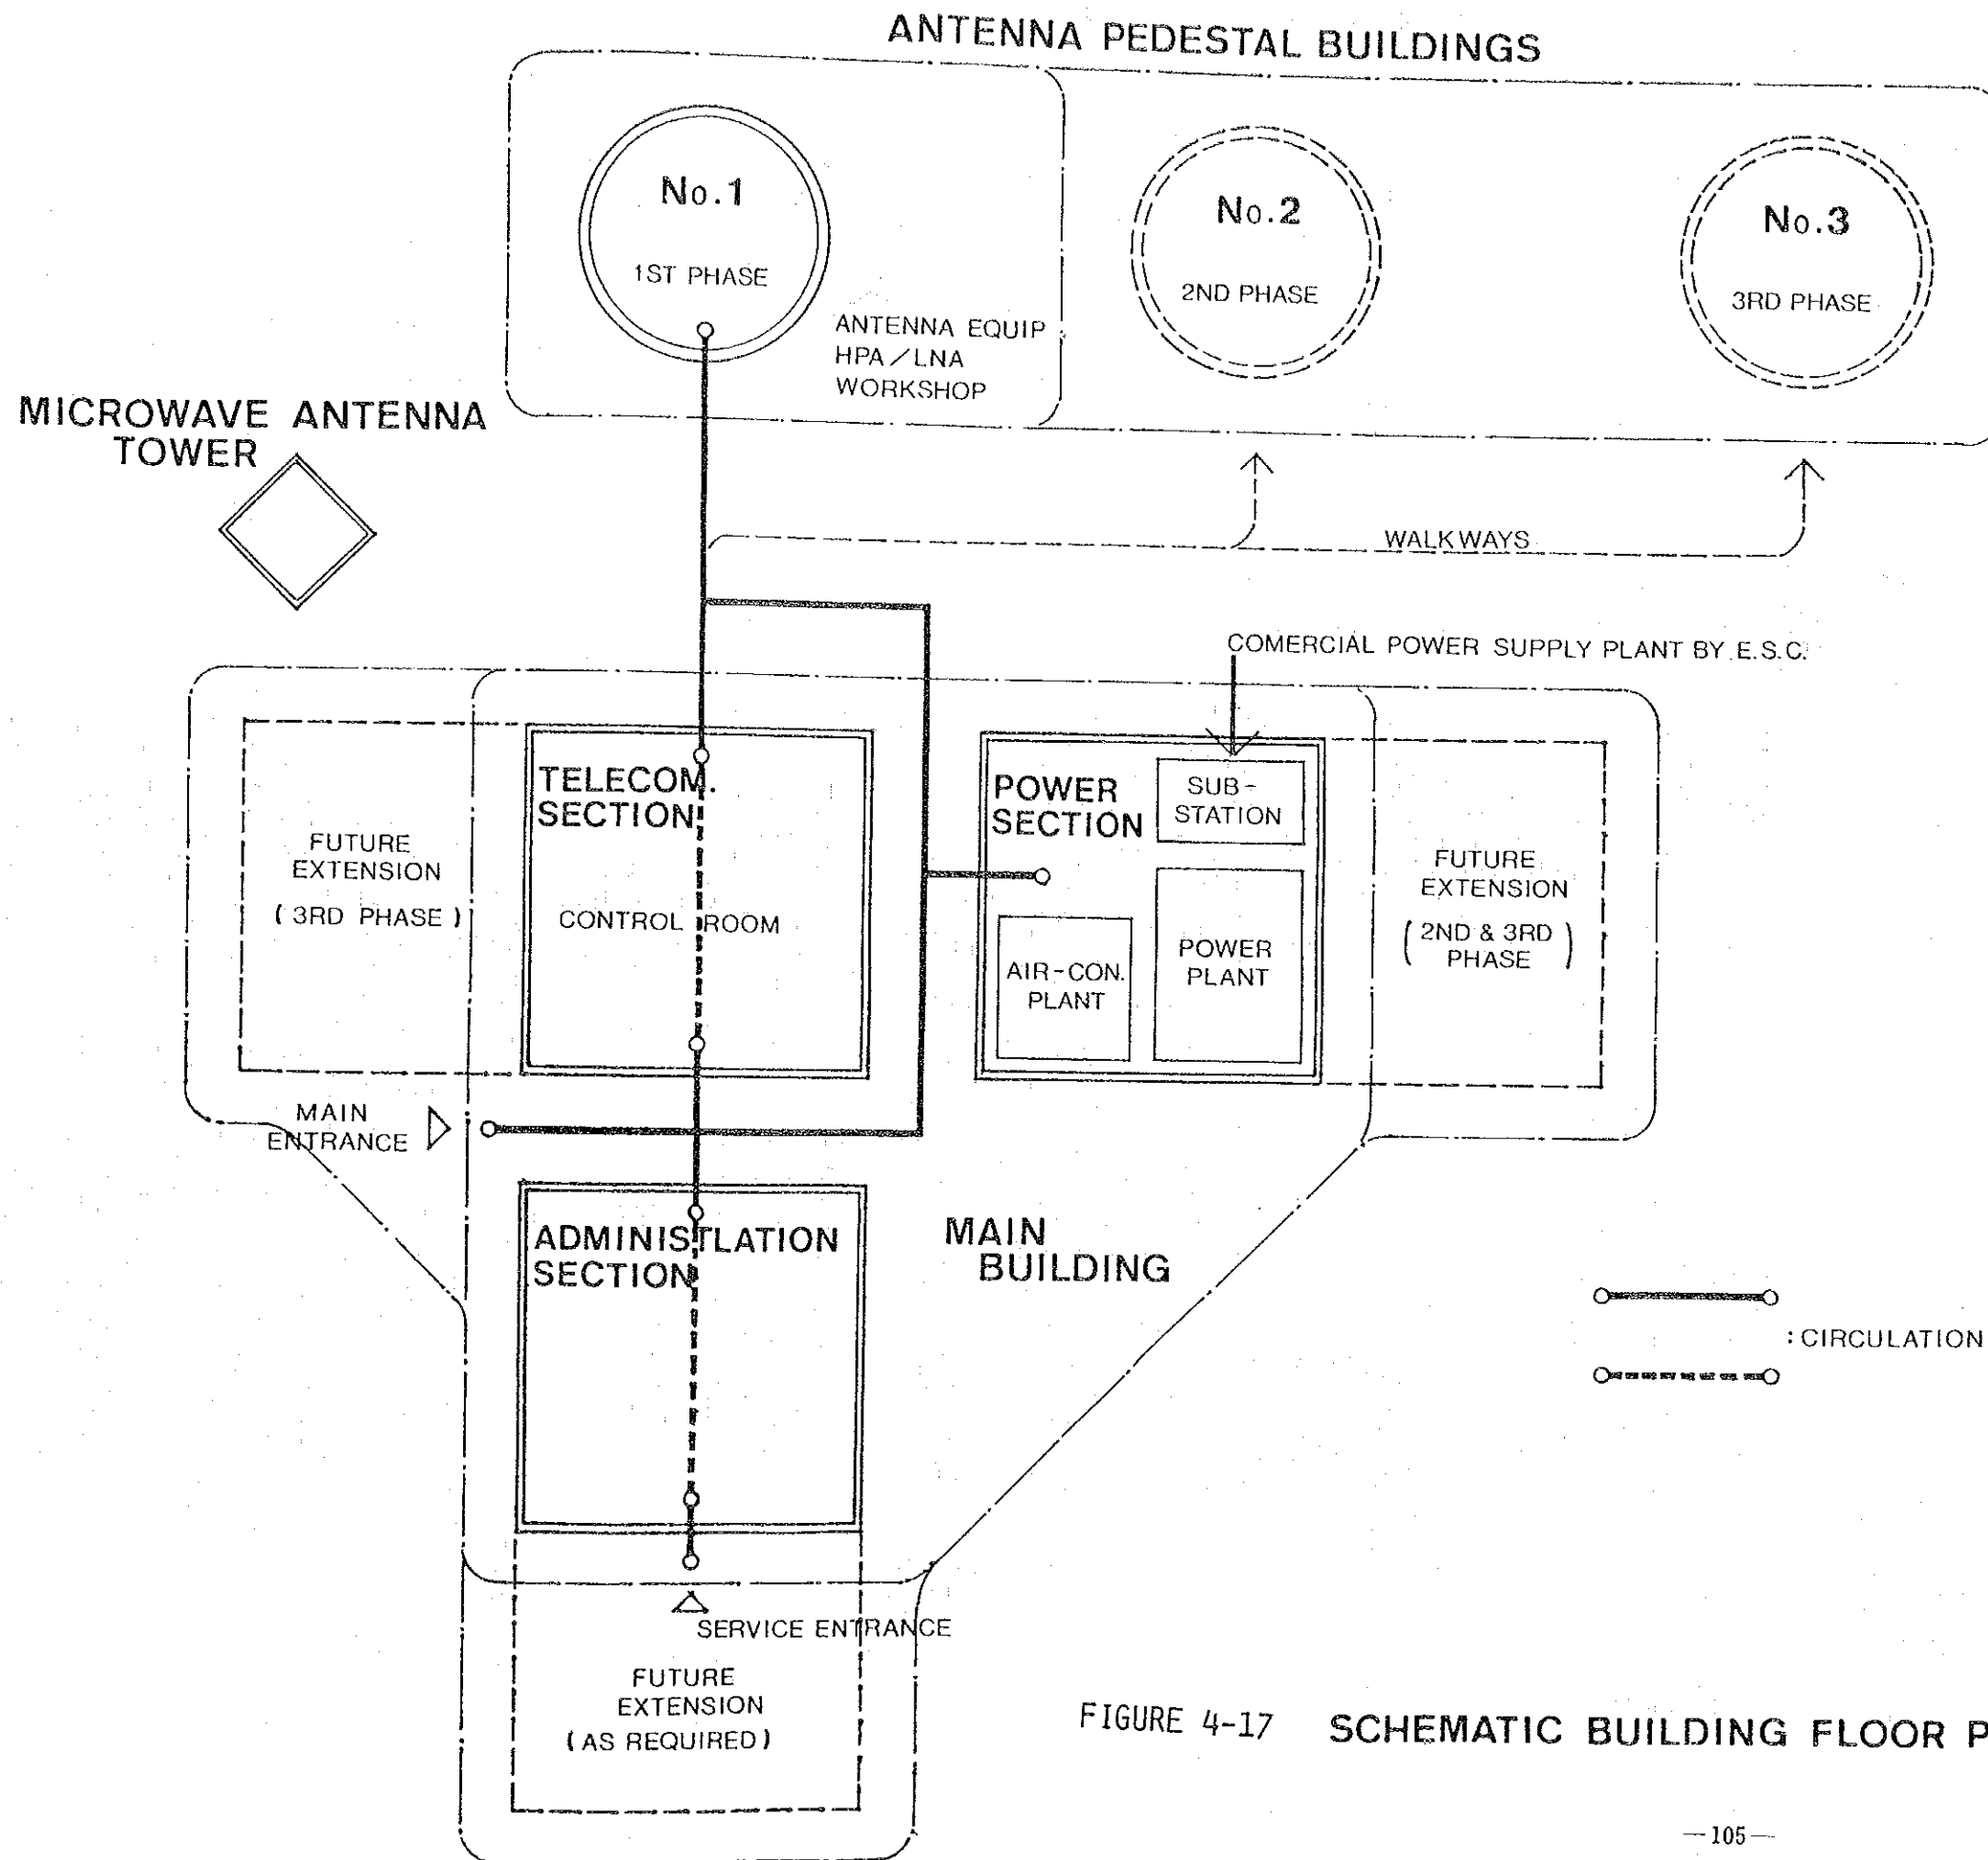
SCHEMATIC BUILDING FLOOR PLAN
